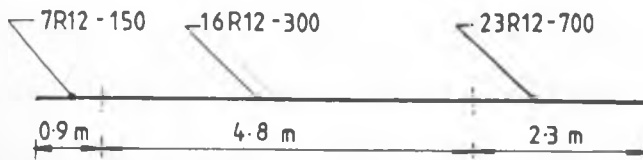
ARRANGEMENT OF VERTICAL STIRRUPS
